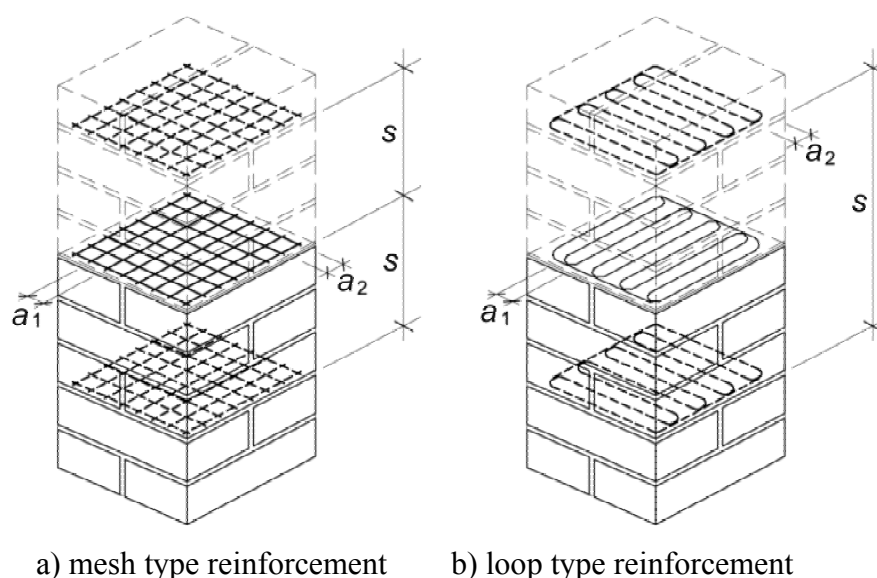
Masonry columns with bed joint reinforcement (according to PN-B-03002:2007)
